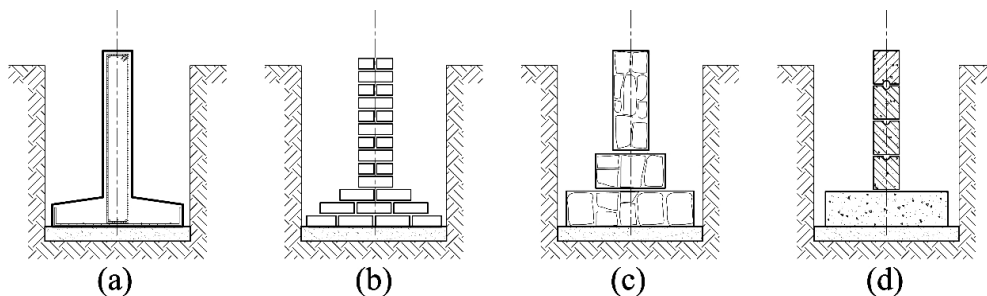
12: Most popular material types of foundation, a. concrete, b. brick, c. stone, d. concrete block
